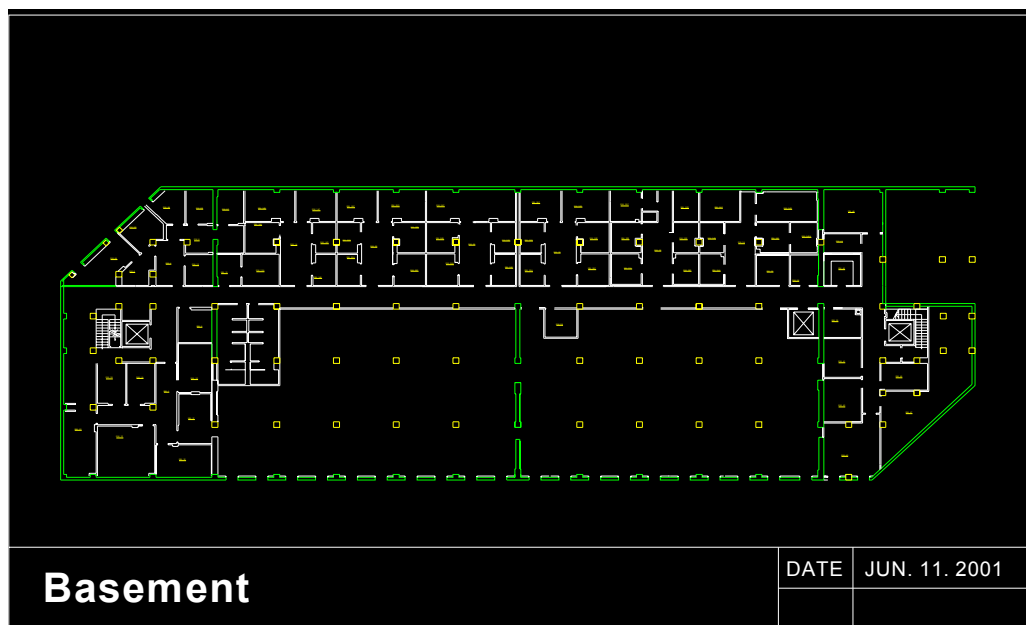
Example of LSA Building Blueprint, With Only Walls Drawn.
